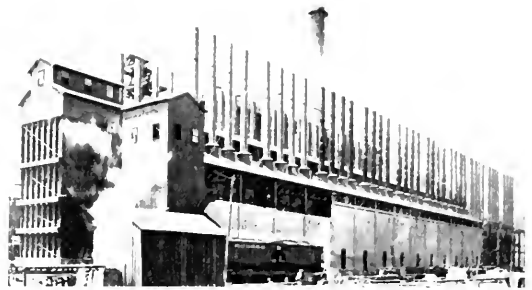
GENERAL VIEW OF BOILER HOUSE NO. 2.
